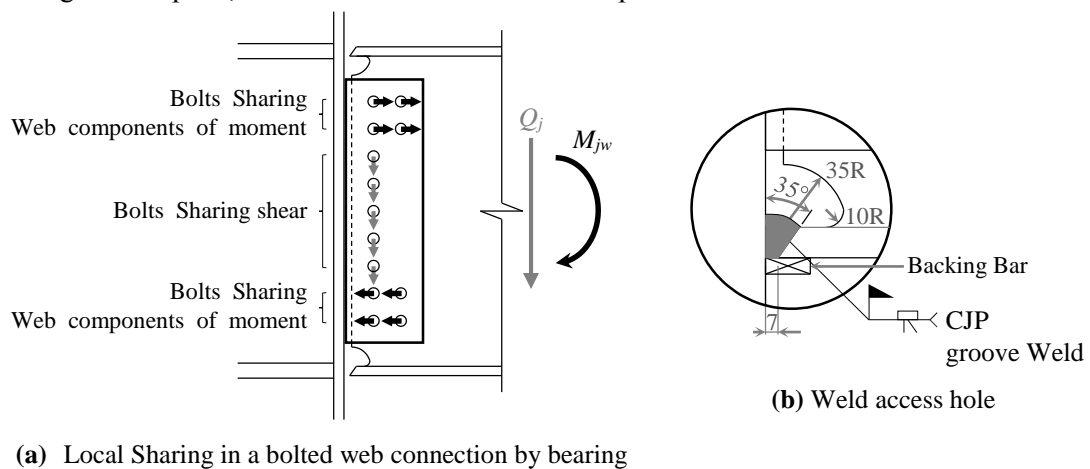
Typical Welded Flange-Bolted Web (WFBW) Connection in Japan
